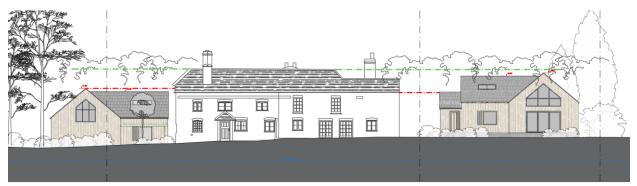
Ridge heights of Dwelling 1 step down towards the existing Farmhouse
